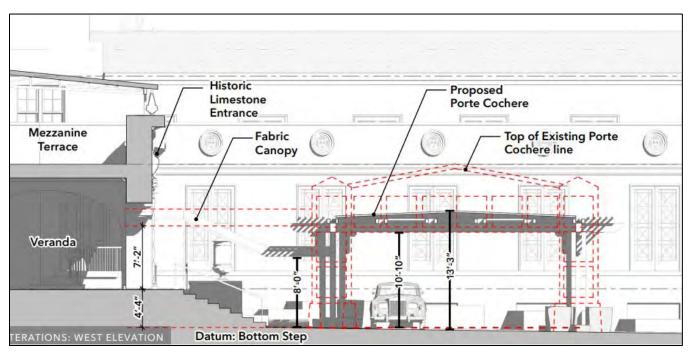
Section of new porte cochere in gray with the red outline of existing porte cochere to be demolished.
